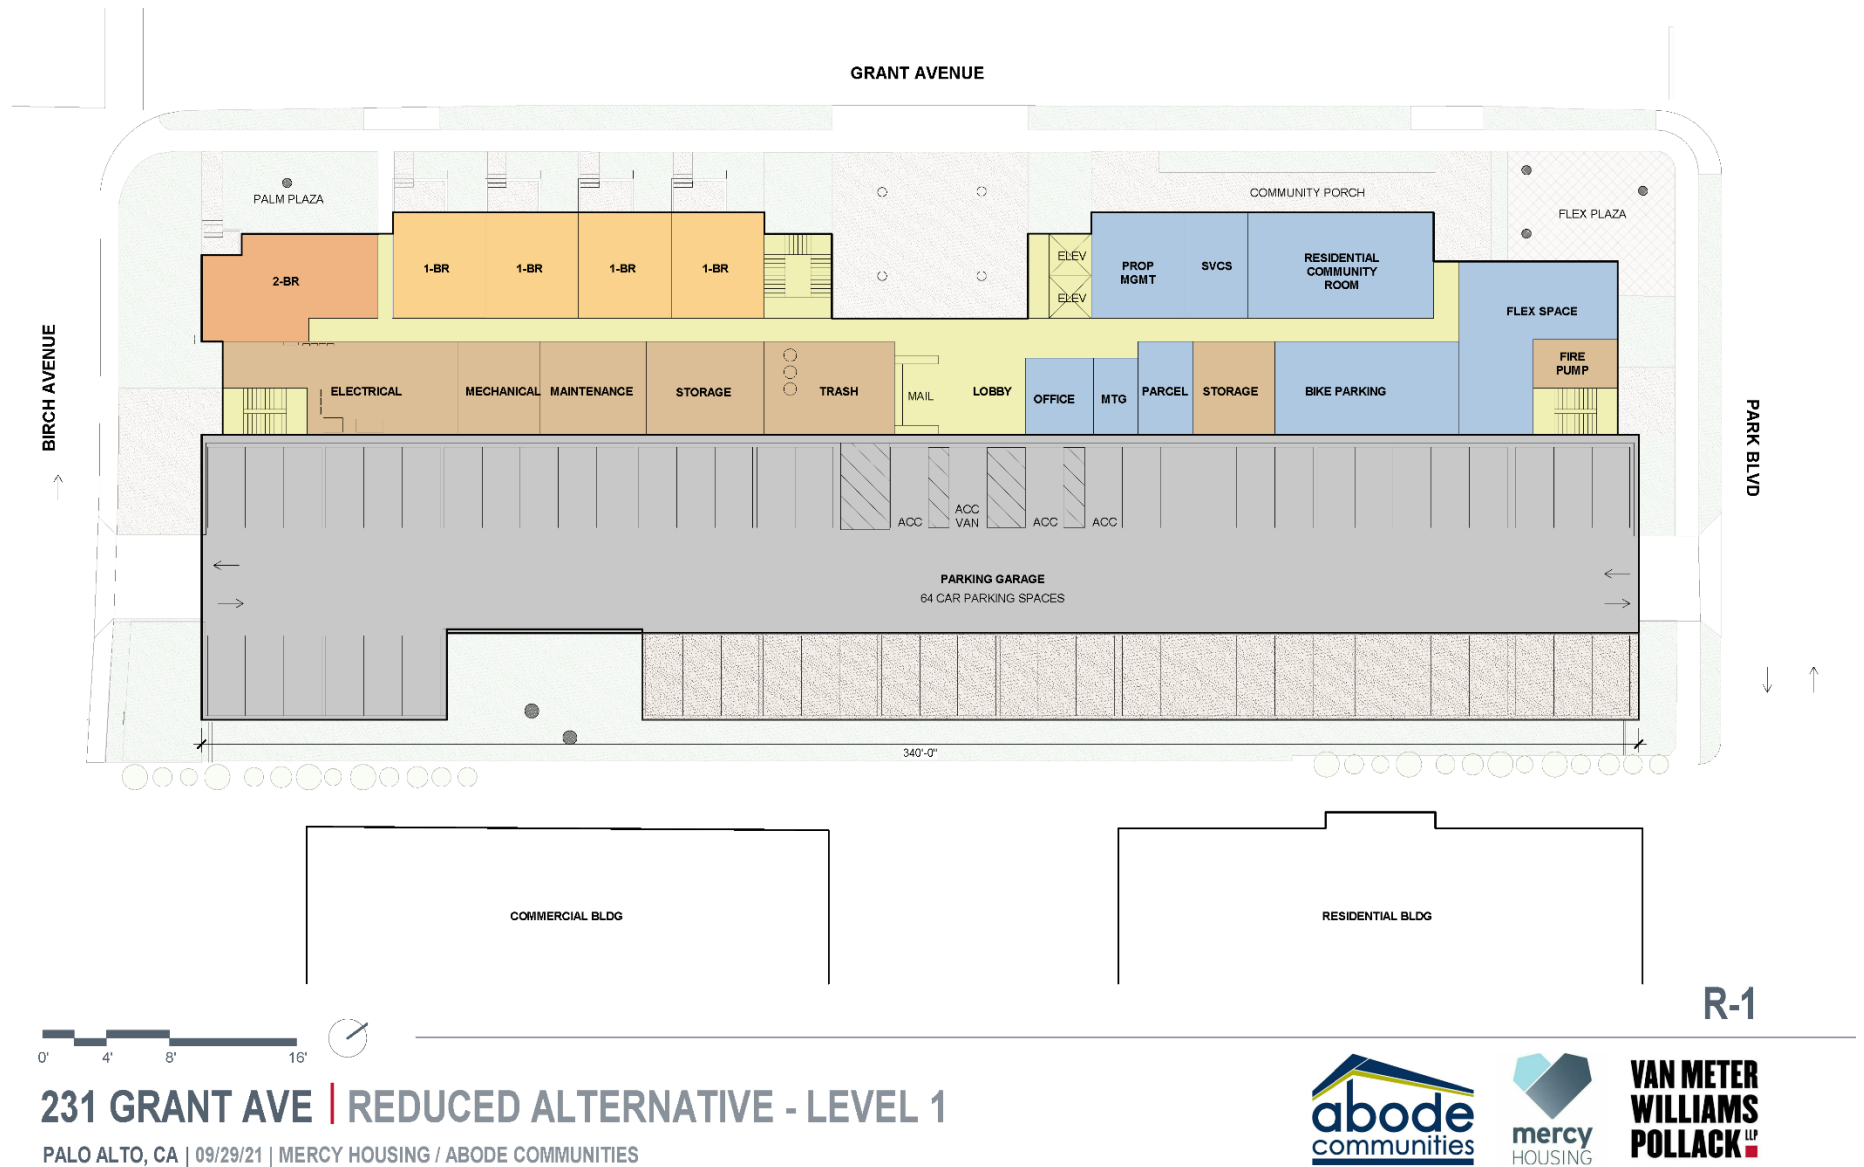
Conceptual Ground Floor Site Plan – Alternative 2
